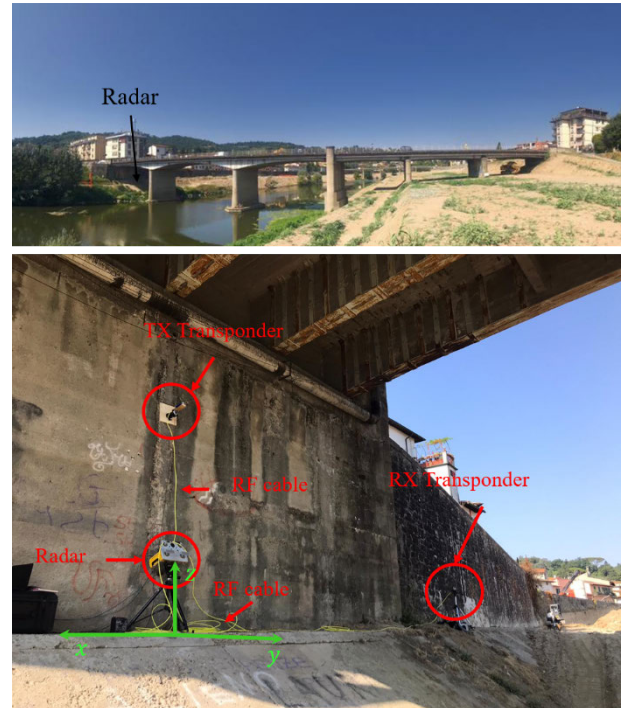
Signa bridge (upper picture) and radar installation (lower picture).
